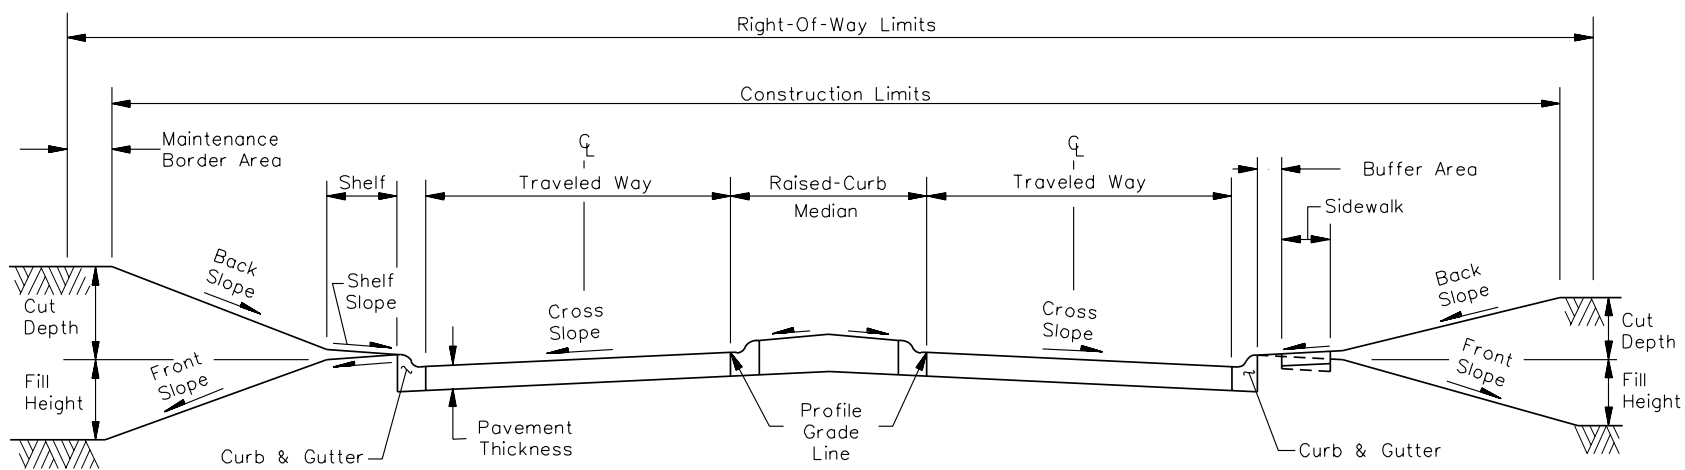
B TYPICAL URBAN CROSS SECTION ELEMENTS
